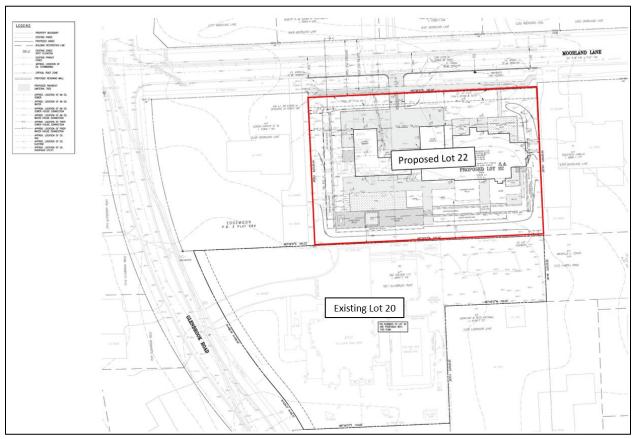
Administrative Subdivision Plan Depicting Current Proposal - Proposed Lot 22. Existing Lot 20 shall remain unchanged with this amendment.
